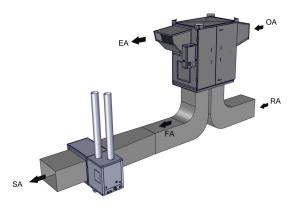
TYPICAL INSTALLATION OF INDOOR SEPARATE INLET EXHAUST FURNACE
